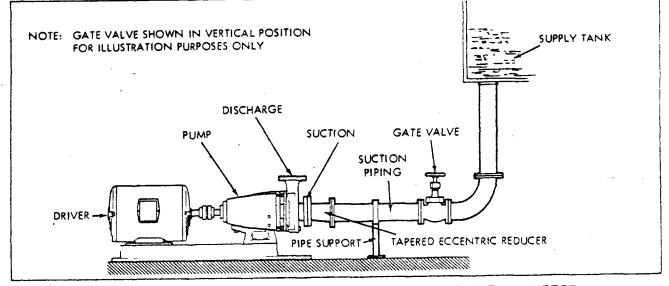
RECOMMENDED FLOODED SUCTION PIPING - SHORT AND DIRECT
